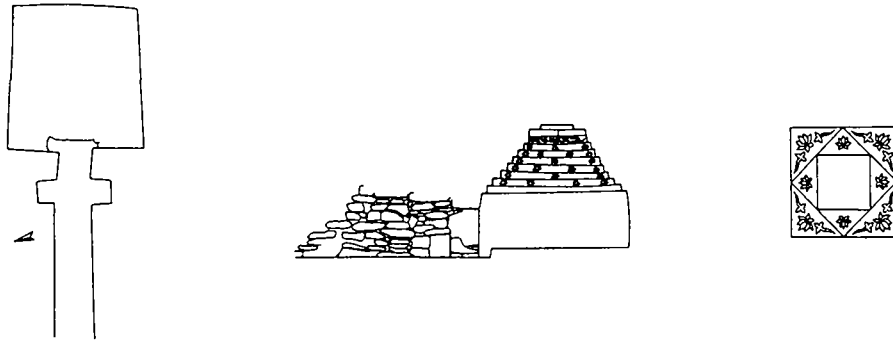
Ground plan, section (scale: 1 : 200) and ornaments of the lantern roof (scale: 1 : 100) of the tomb No. 983 at Chib-an-san-sŏng 集安山城 983 號墳 집안산성 983 호분 (after: CSYCYMDK 6, p. 276)
